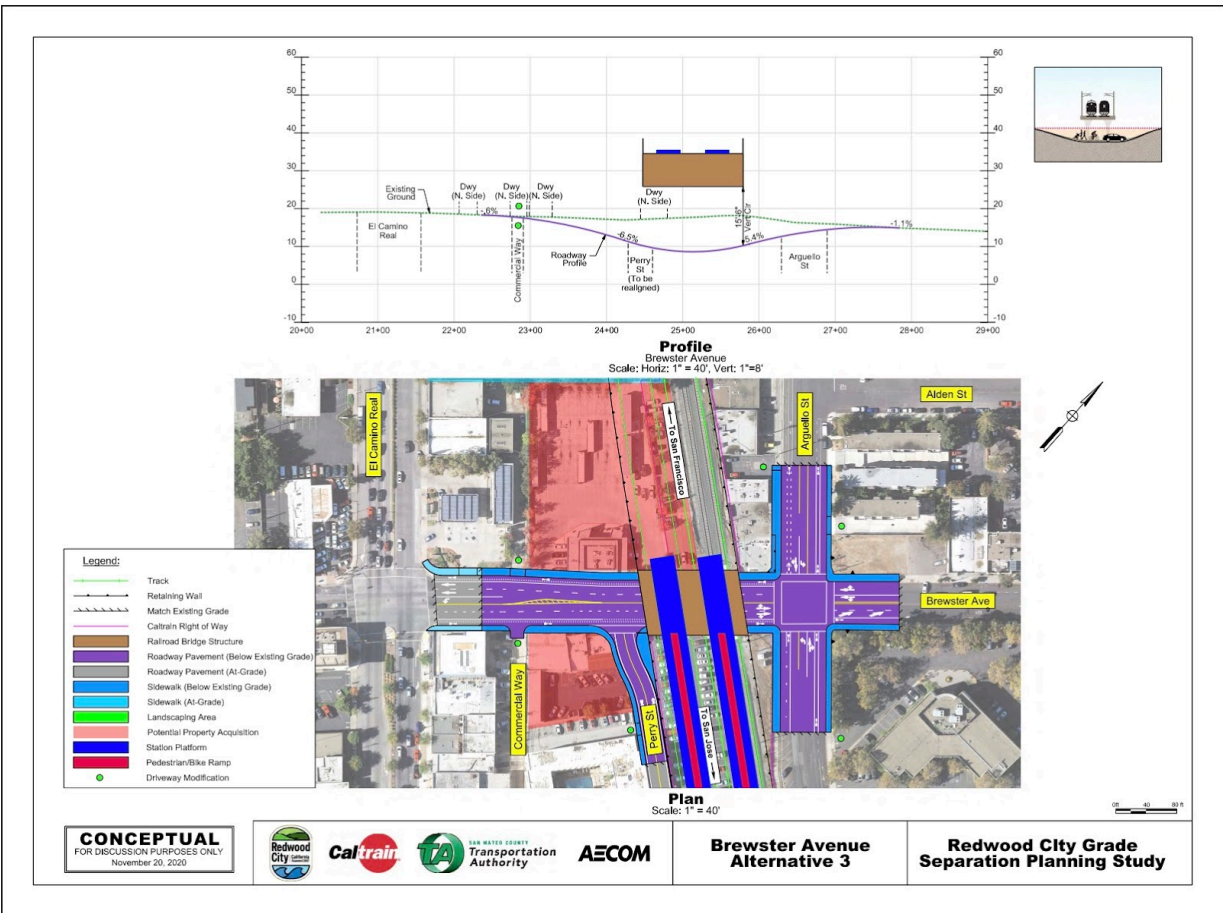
Visual depiction of modifications to Brewster Avenue for design alternative 3 (Redwood City, 2020).
